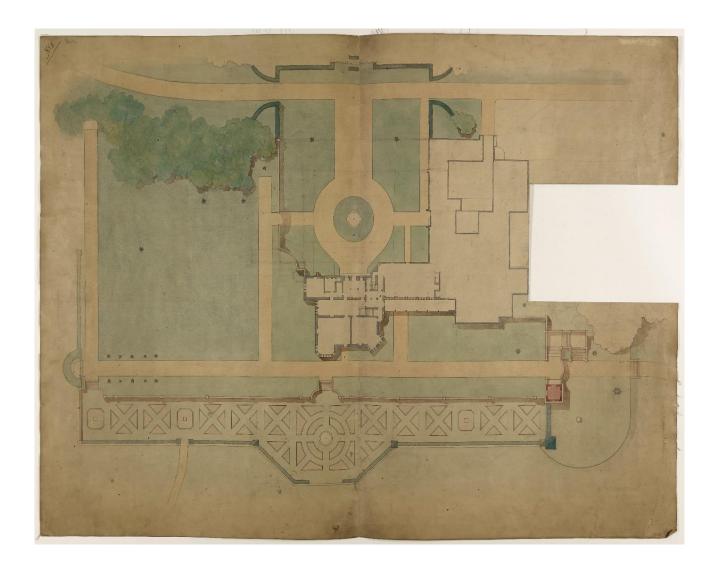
The garden plan and layout for the terrace at Minley Manor, not executed, 1886. *RIBA PB212/3*.
